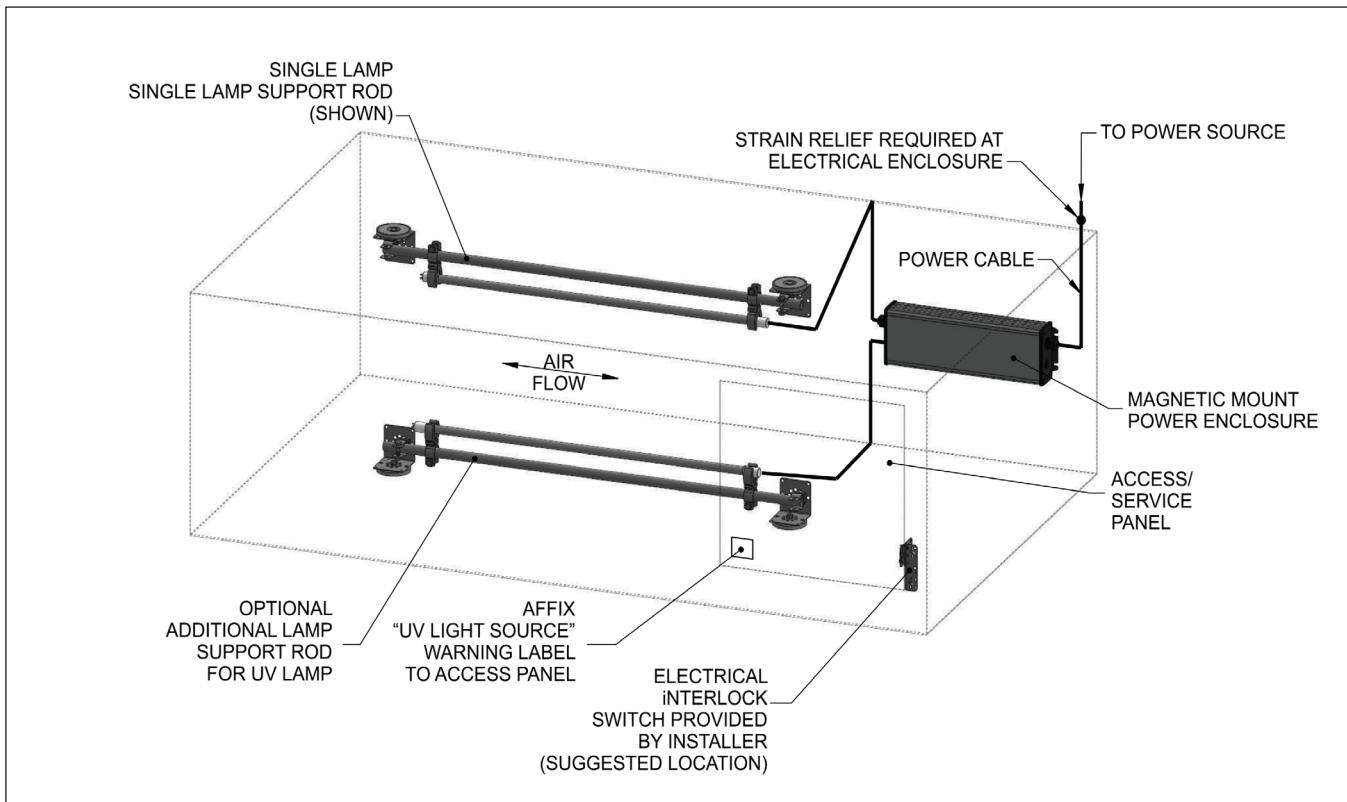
Generic HVAC Ductwork Installation (Horizontal Rod Support)
